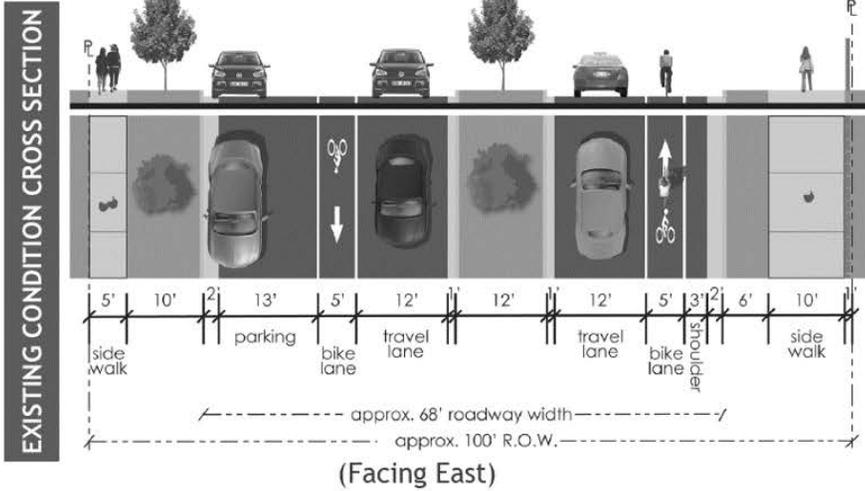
Cross Section Alternatives: Ash St to Sheridan Blvd
